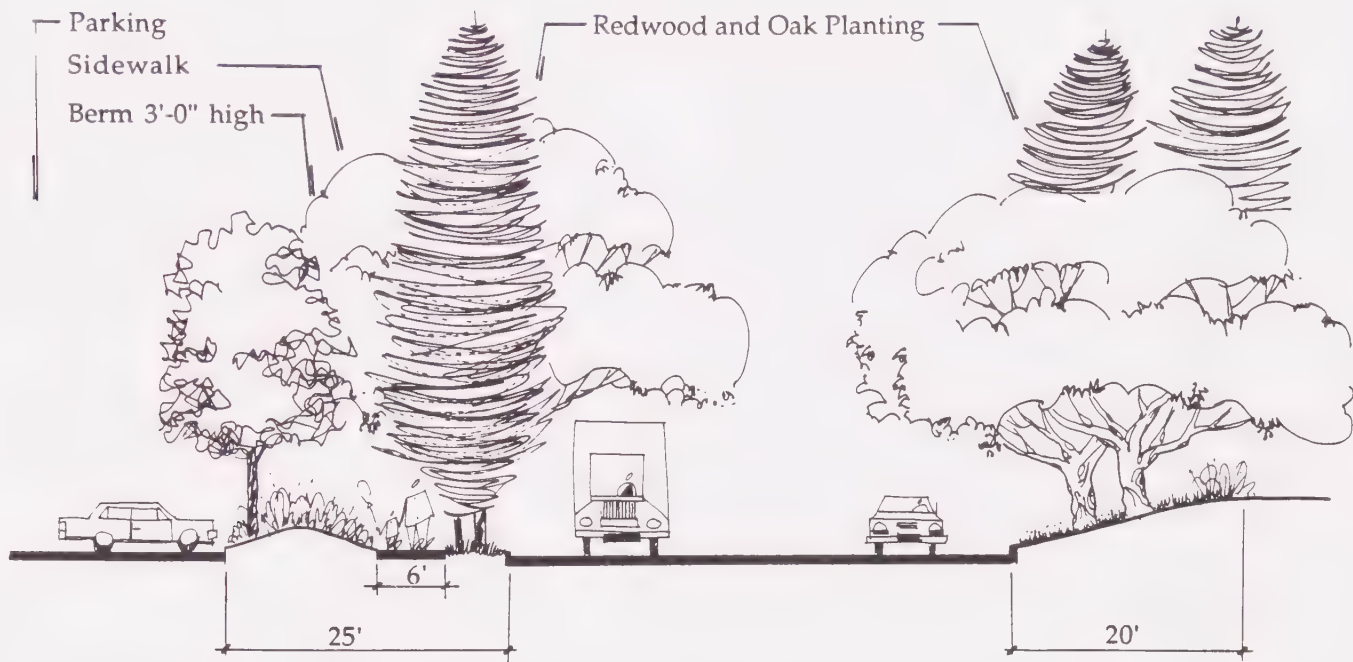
Typical Cross Section at Old Redwood Highway looking Northeast (E' - E)
